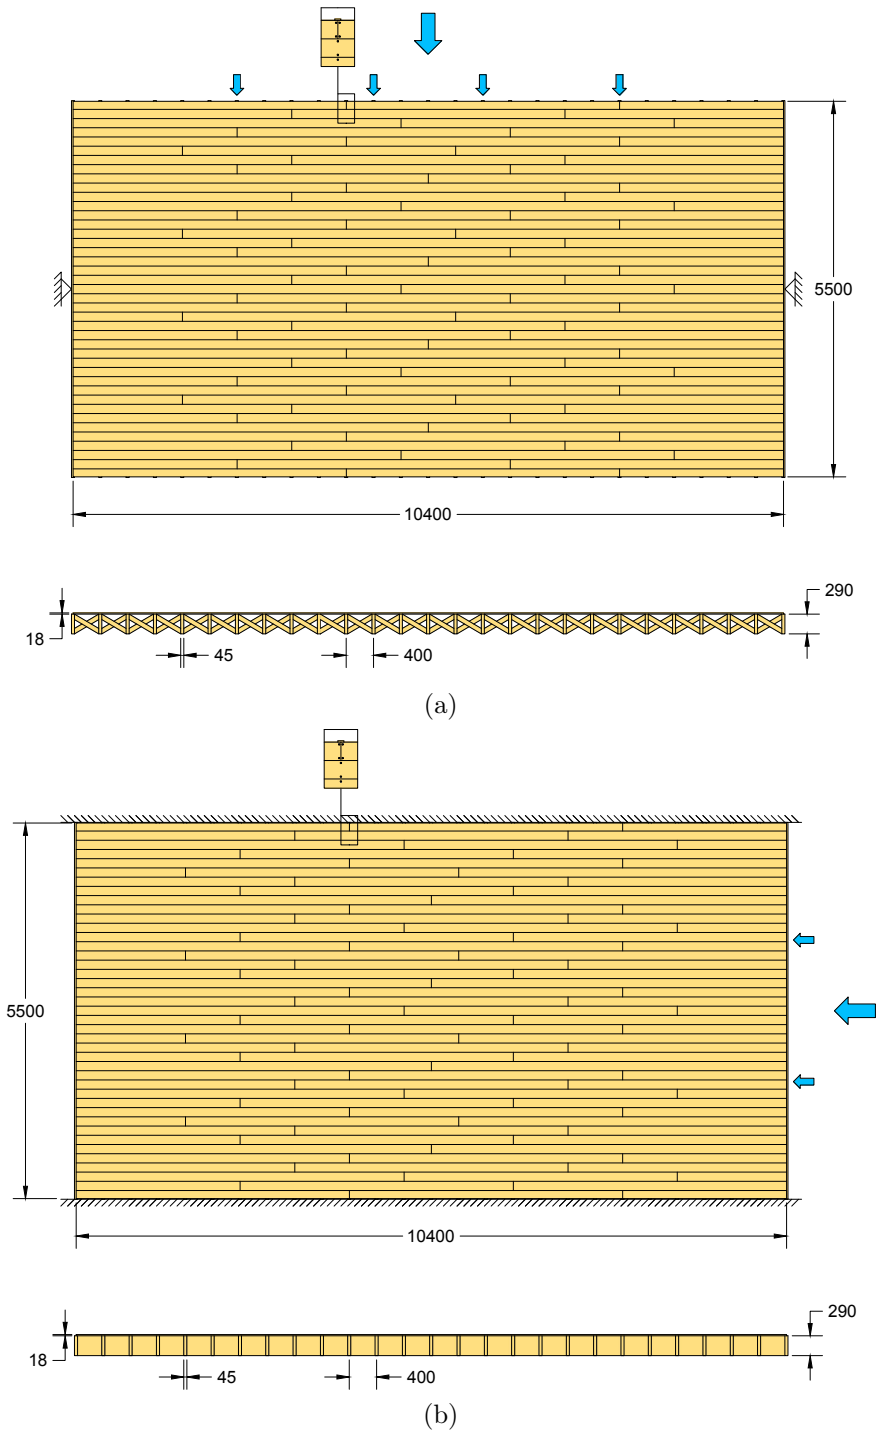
Timber diaphragm samples tested by [24]: (a) specimen loaded parallel to the joists, (b) specimen loaded perpendicular to the joists; dimensions in mm.
